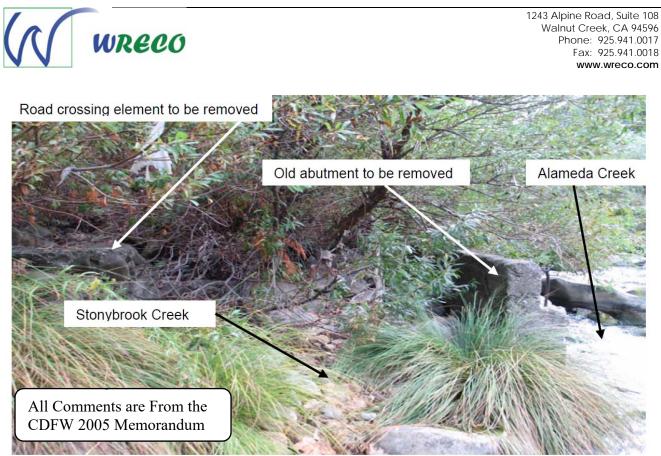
Photo and Comments of the Old Road Remnant and Abutment from the CDFW Memo (2005) (facing upstream)
